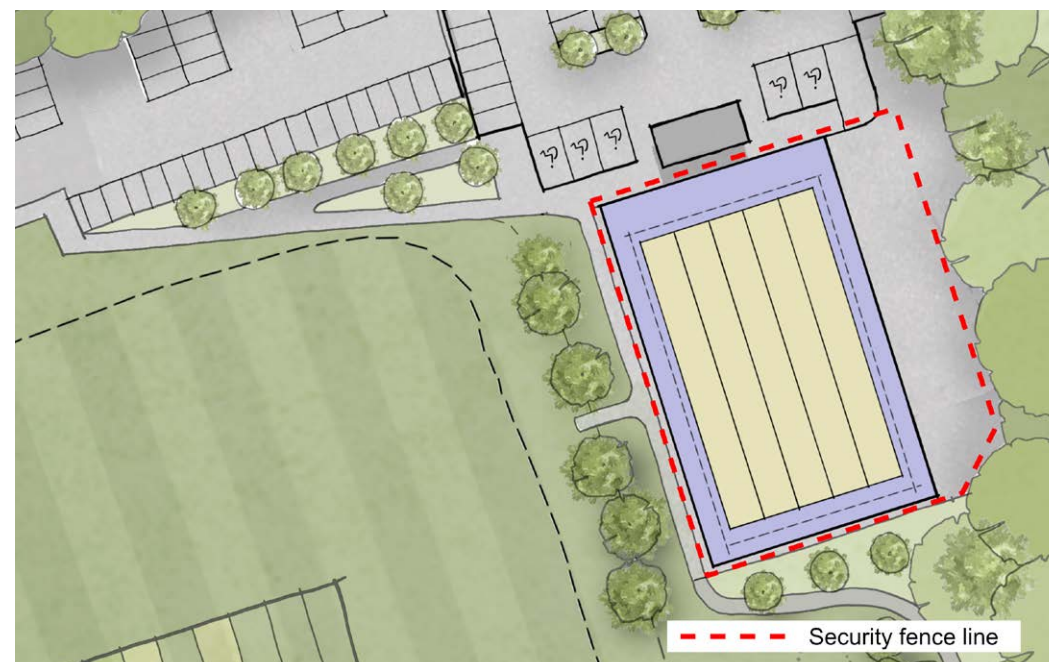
Indicative fencing layout around a Covered Outdoor Cricket Facility. In this example additional spectator and storage space is encompassed to the east of the facility. Depending on wider site usage the ancillary building could be included in the fence line, but that will vary site to site.
